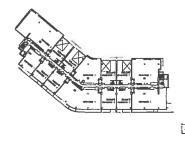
BUILDING PLAN - LEVEL 6 ONE BEVERLY HILLS
